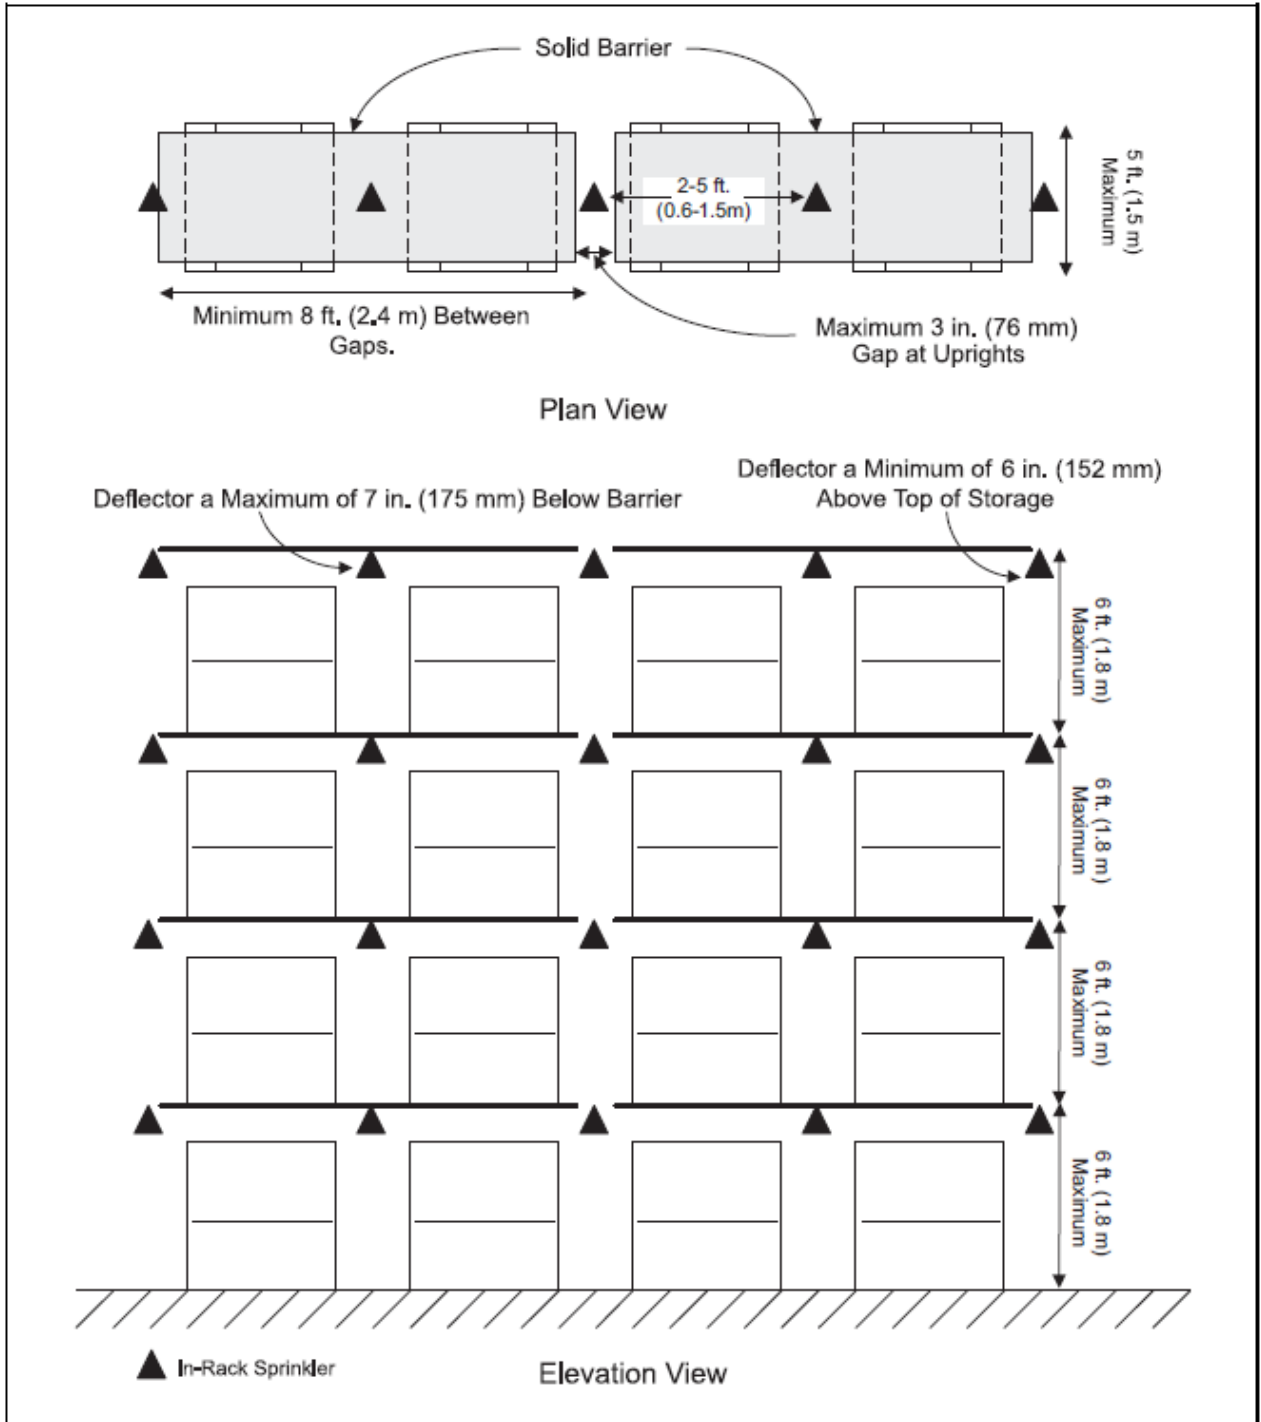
Single-row rack in-rack sprinkler layout for li-ion cells/modules/batteries
